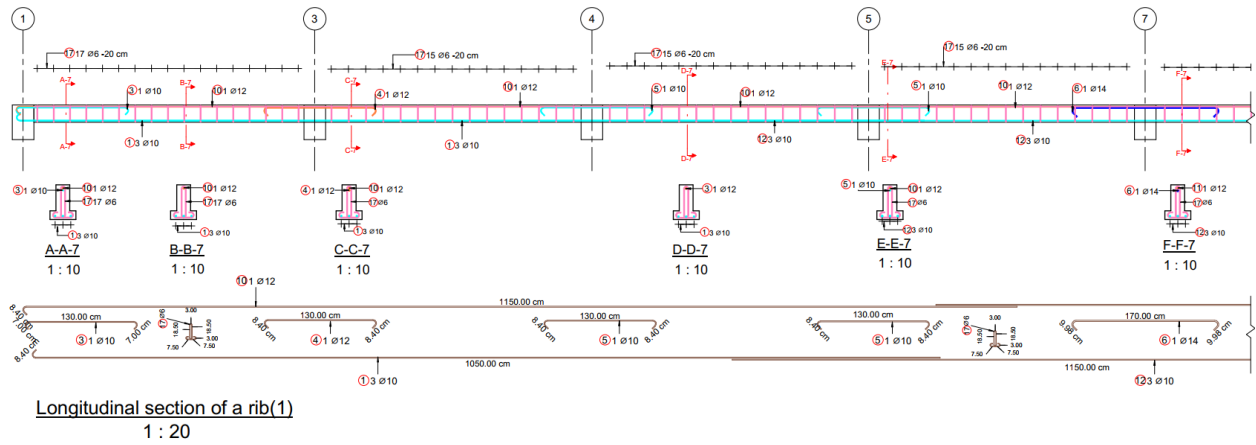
Longitudinal cross-section of the rib (part 1)
